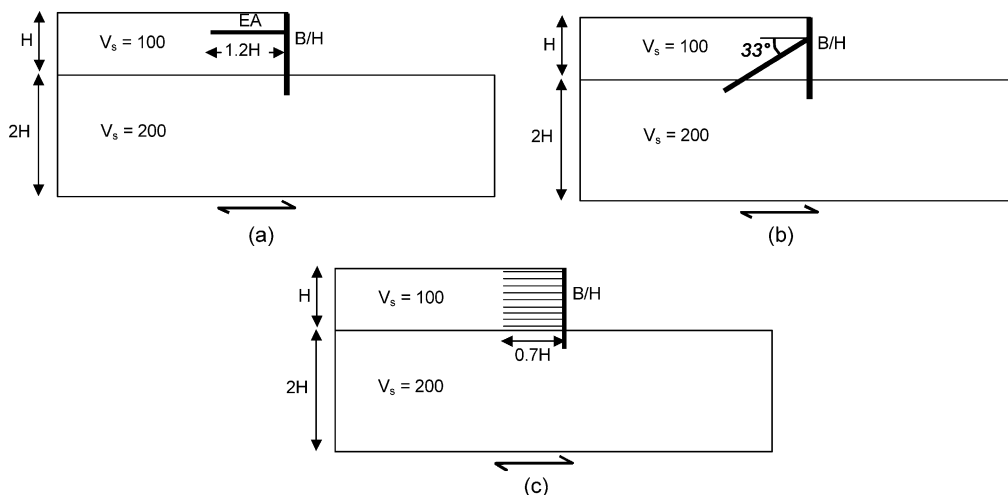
The three different flexible walls considered in the study: (a) prestressed-anchored pile (PAP) wall with horizontal anchors, (b) PAP wall with inclined anchors, and (c) reinforced-soil (RS) wall.
